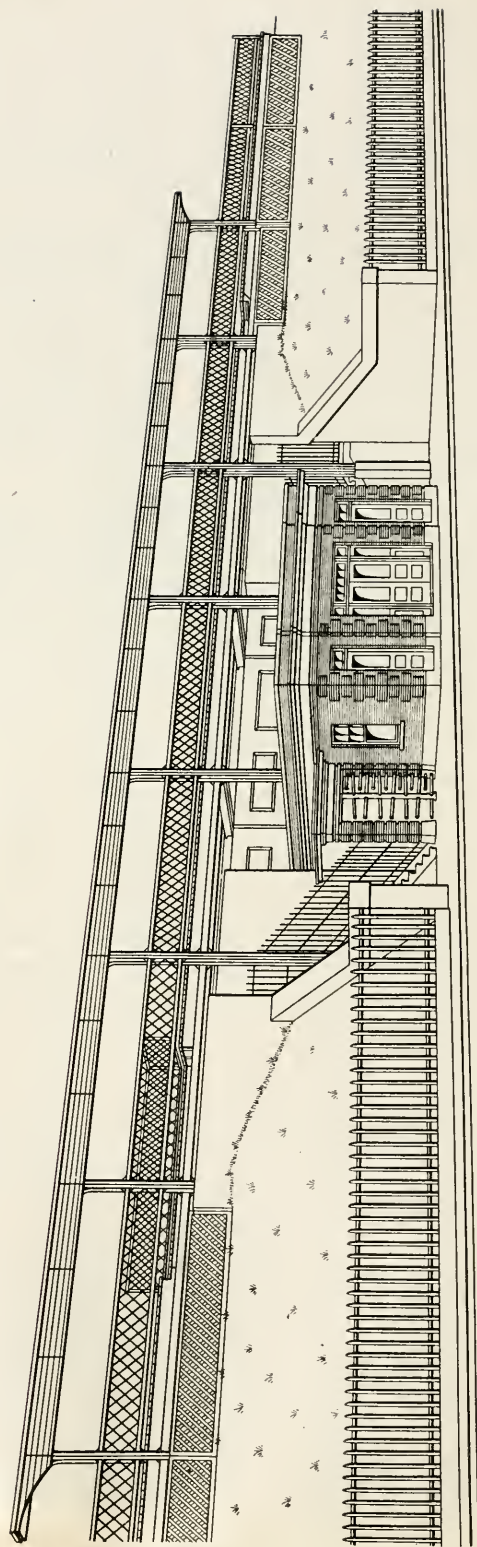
PERSPECTIVE OF DAVIS STREET STATION LOOKING NORTHWEST.
